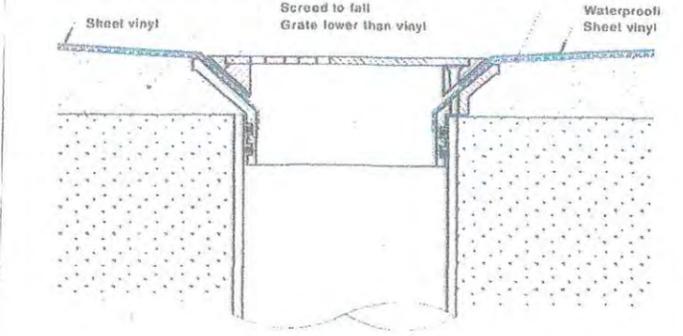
(C) - Vinyl installation - Push-in vinyl sheet waste
